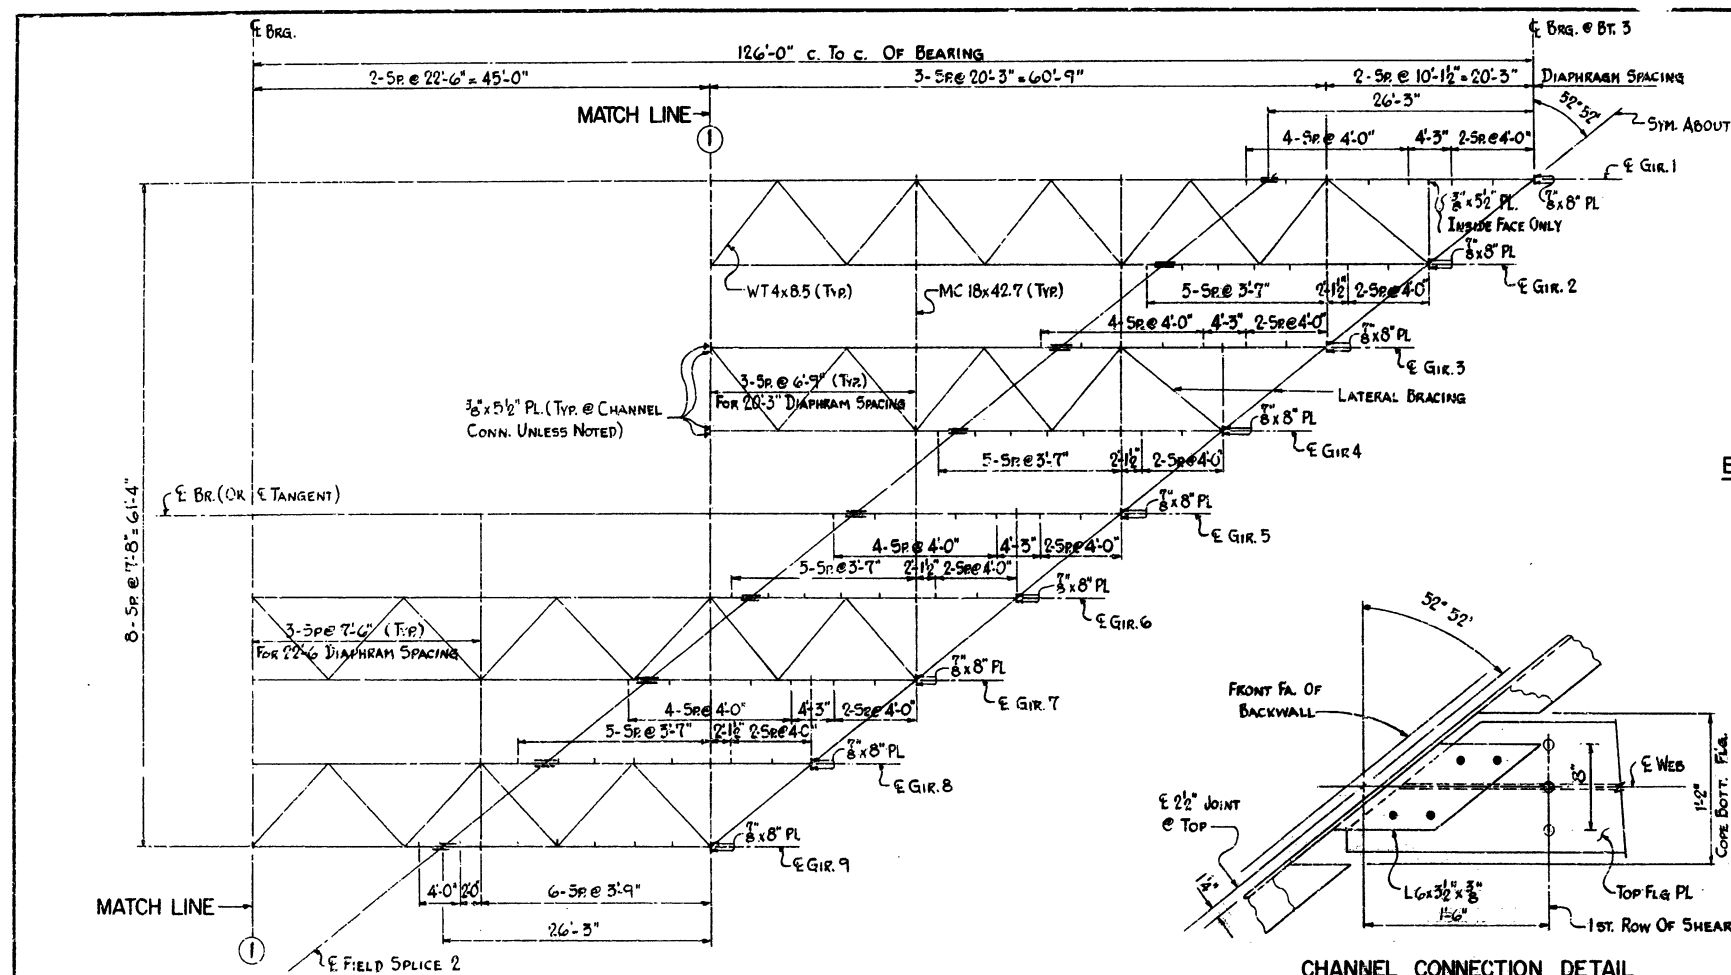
DETAILS OF CONTINUOUS WELDED PLATE GIRDER UNIT
